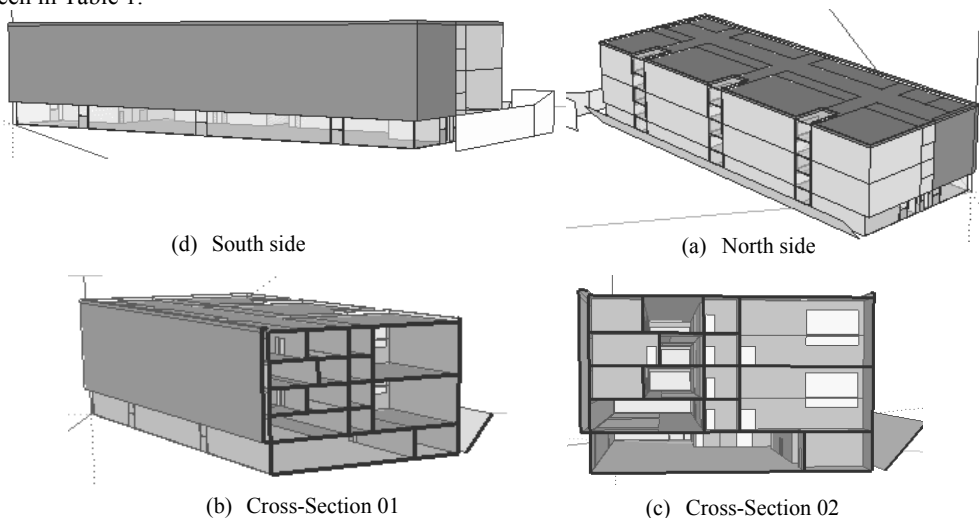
Energy-plus geometry of Ayazağa Central Classrooms Building
